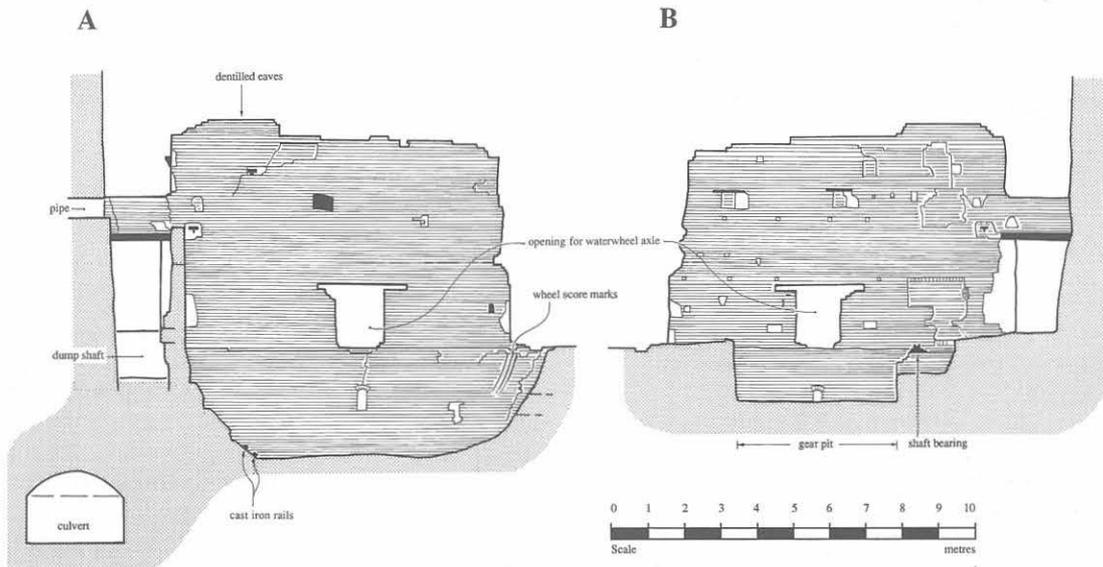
External (A) and internal (B) elevations of the turning mill north wing. The external elevation shows the integral wheelpit and its position in relation to the culvert below ground linking the upper furnace pool to the former lower furnace pool.
